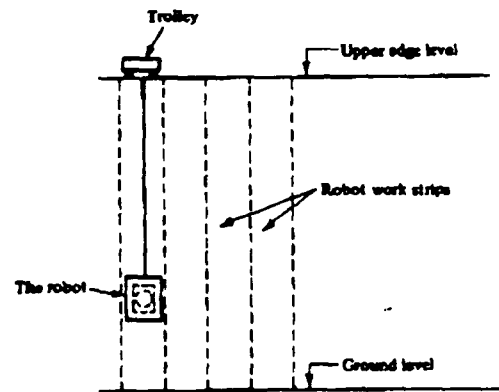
Exterior Wall Finishing Robot Work Pattern
